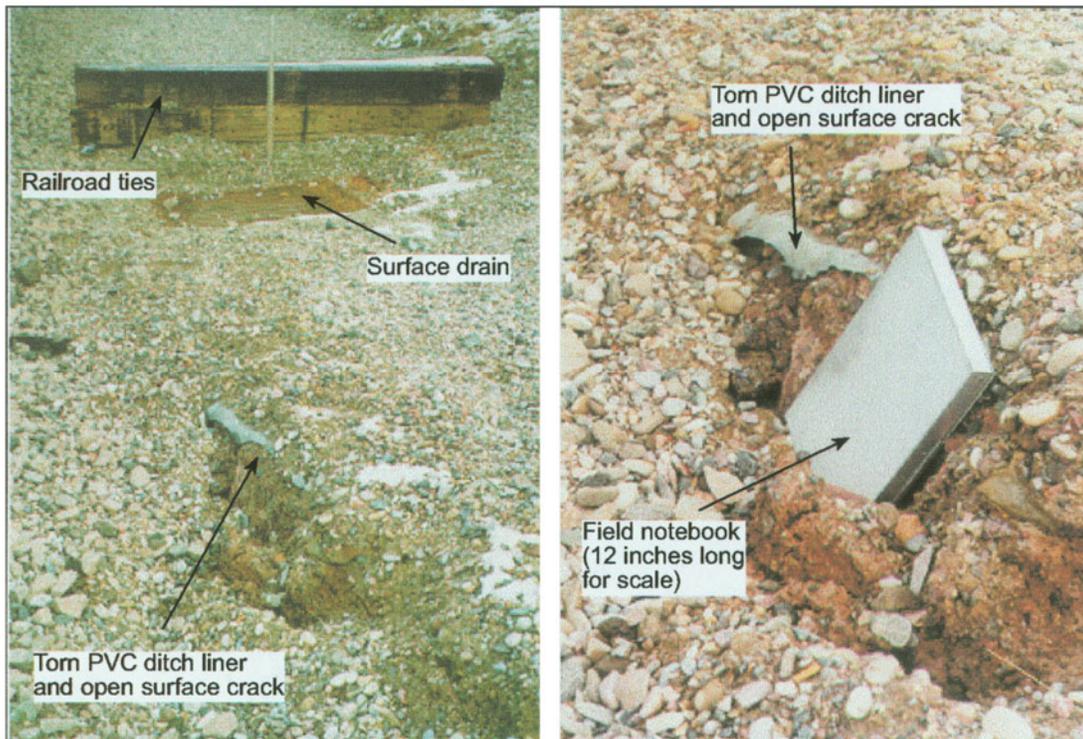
Open-surface cracks and the damaged PVC liner. The PVC liner was installed in 1995 in an effort to redirect surface runoff along the railroad tracks.
